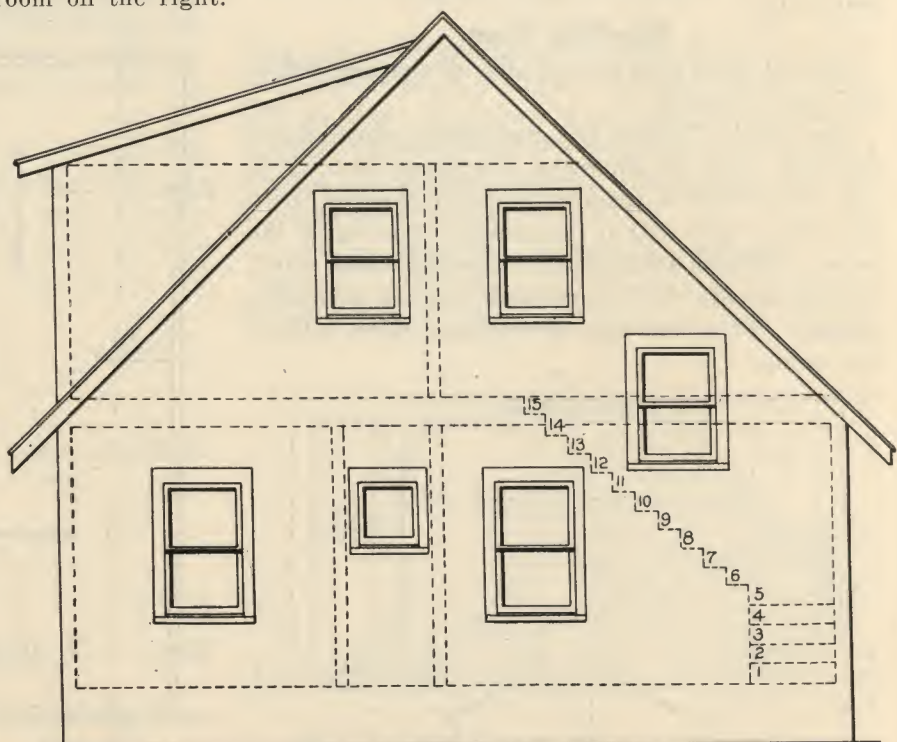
Showing sections of rooms, floors and stairs with dotted lines.
